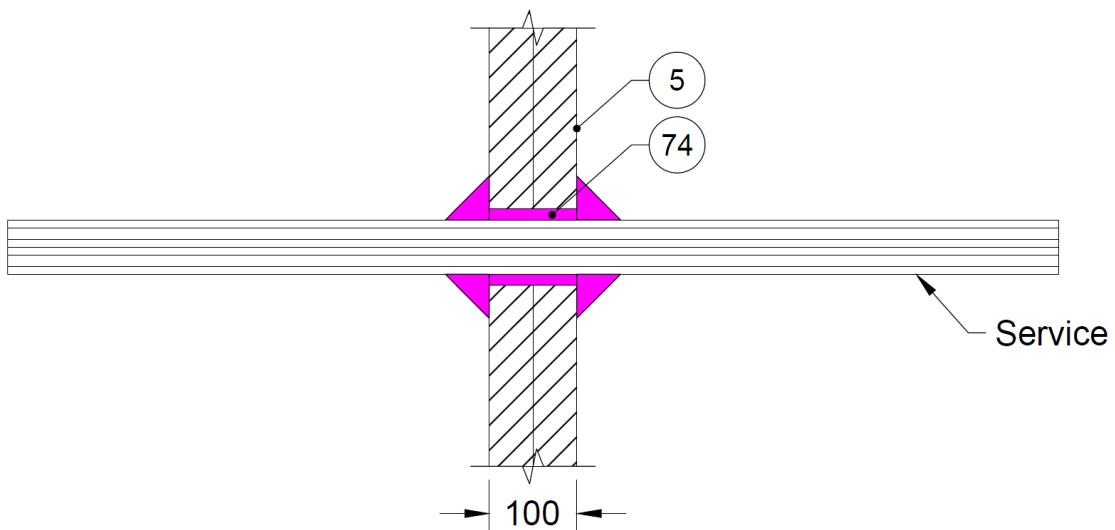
Section View of Pipes Installed in Vertical Substrates
